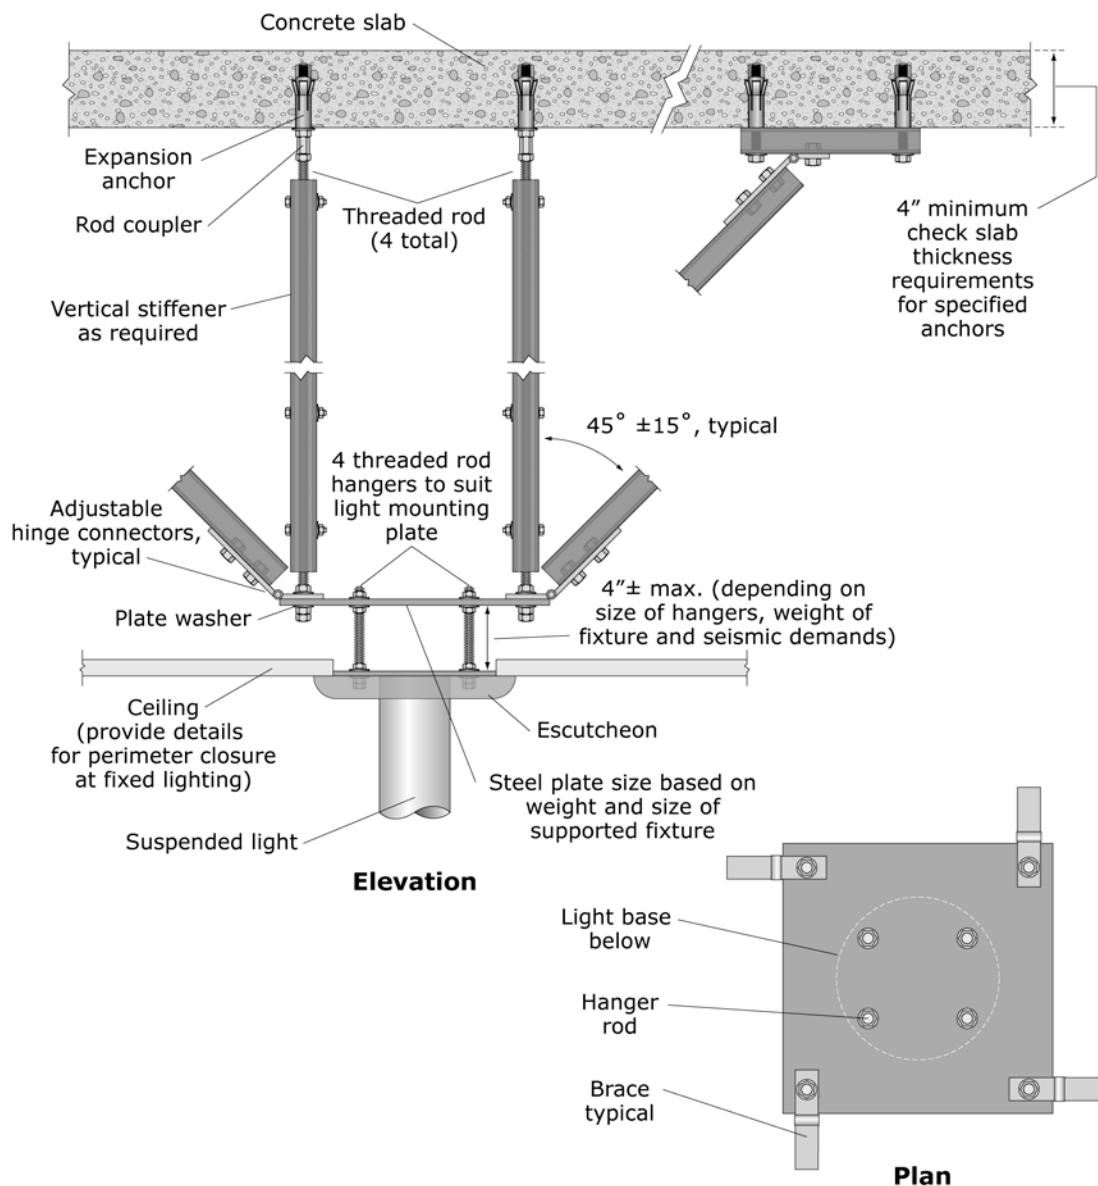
Details for supporting heavy light fixture directly from structure (ER).
